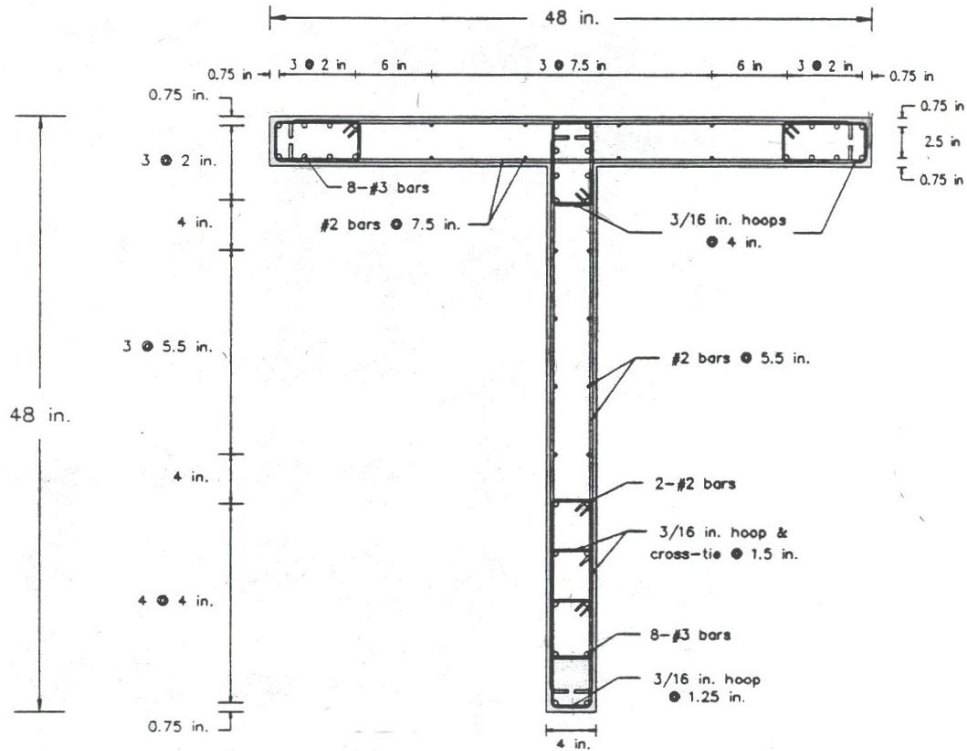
Wall Section TW2 Tested by Thomsen and Wallace [1995]
